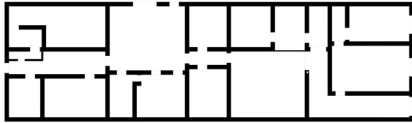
The reconstructed plan of the House No. XXIX. (András Timár, 2025)
